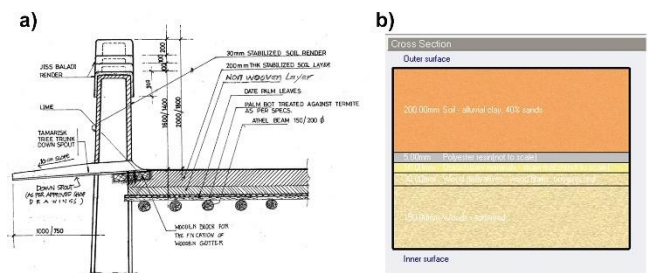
Roof floor layer: a) as built detail, b) design builder data entry roof layer.
